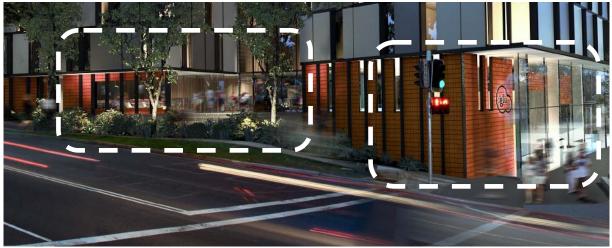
Extract of submitted photomontage showing ground floor section of the proposed development as viewed from the corner of Albert Ave and Thomas Lane. Glazing to common areas/communal recreation areas addresses the street corner and Albert Ave.
